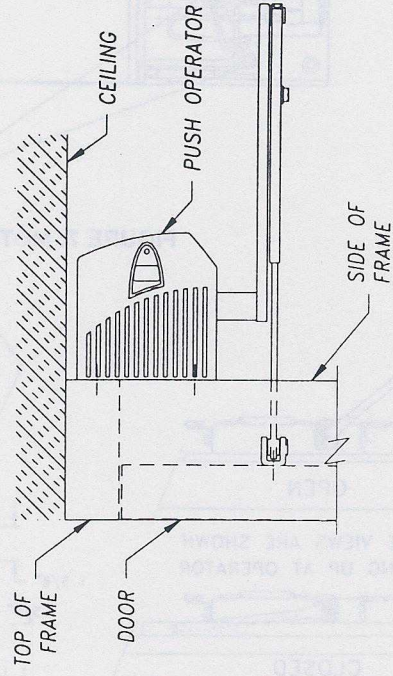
INSTALLATION TEMPLATE FOR LOW CEILING APPLICATION – PUSH ARM ONLY
